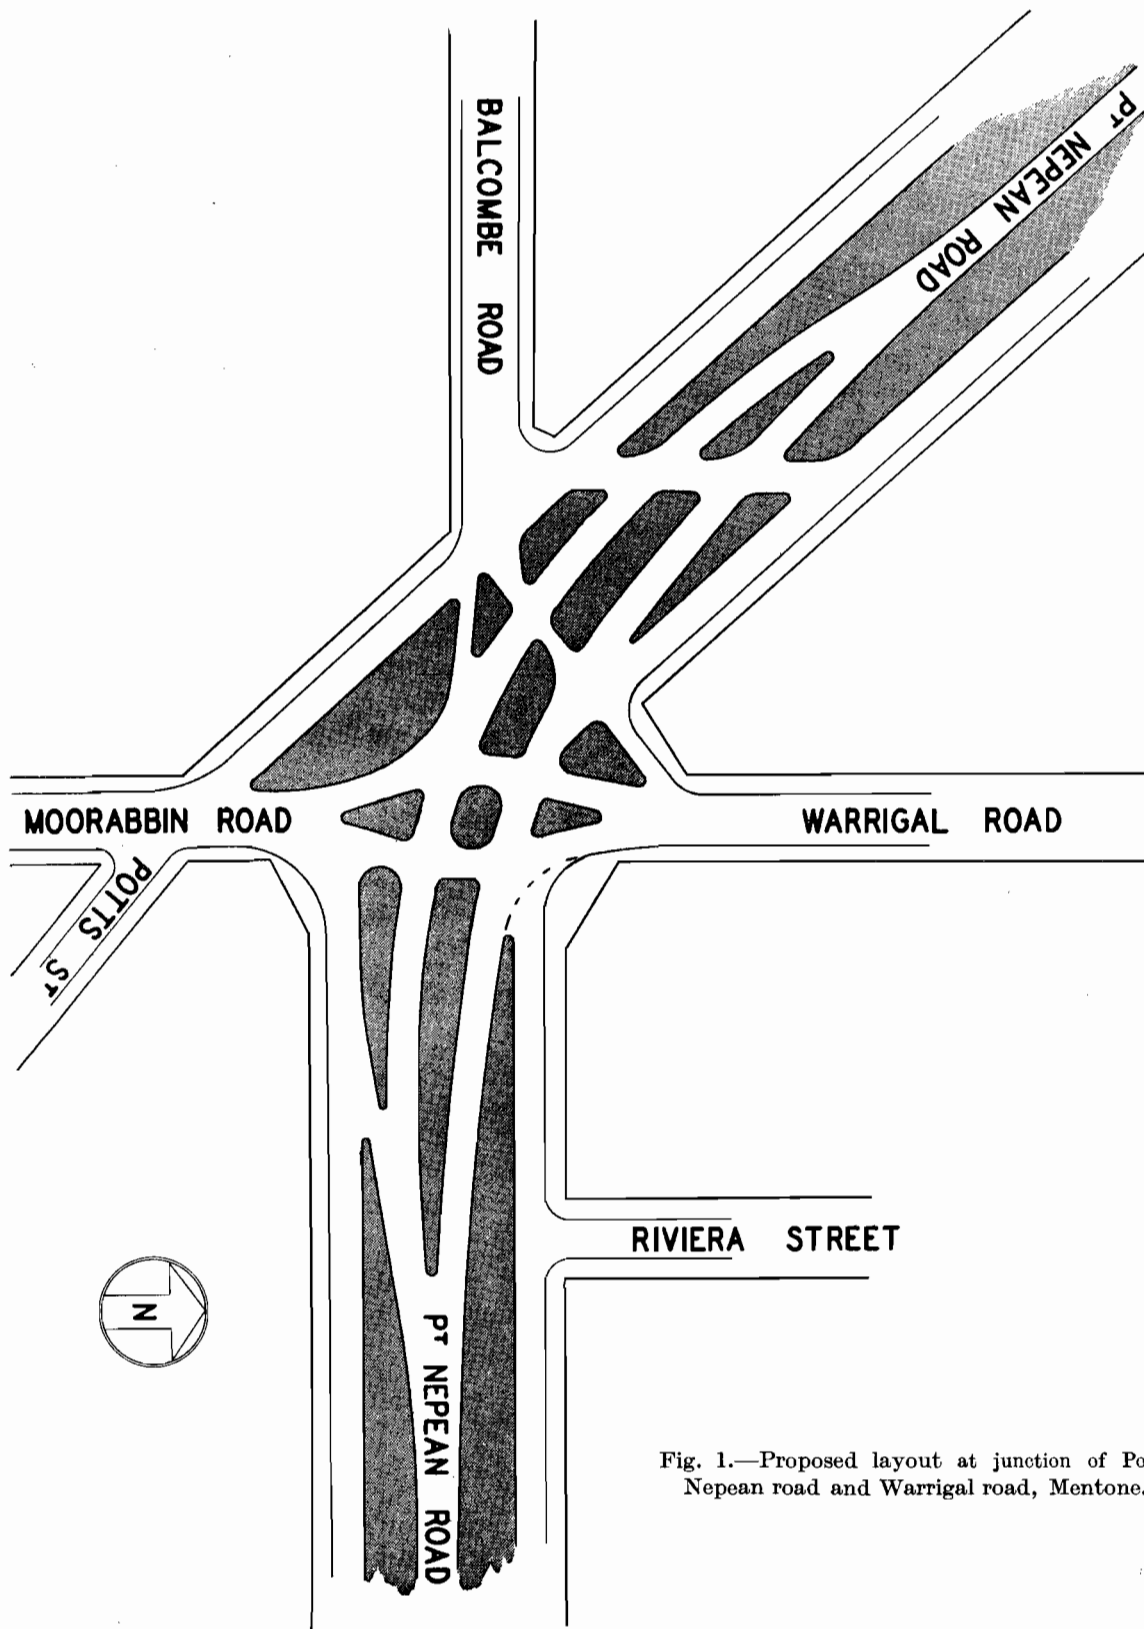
Proposed layout at junction of Point Nepean road and Warrigal road, Mentone.
